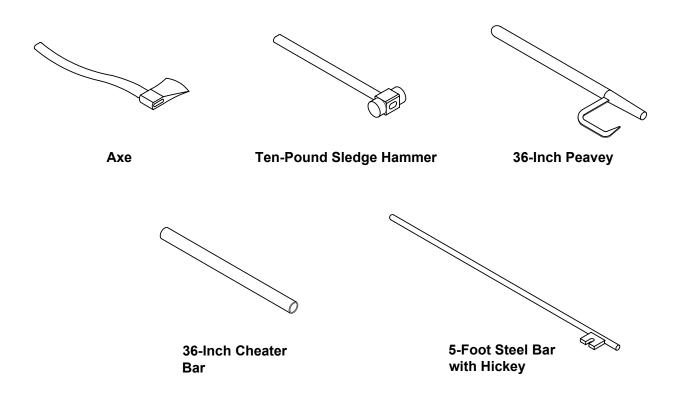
Pile Driver System Pre-Assembly Inventory Components (Sheet 4 of 4)
